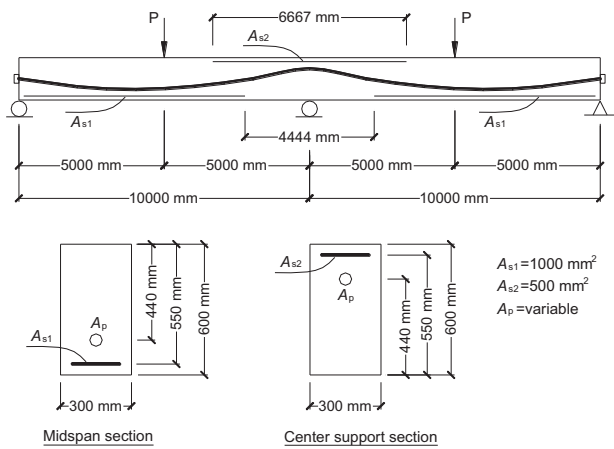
Details of continuous prestressed concrete beam for numerical evaluation.
